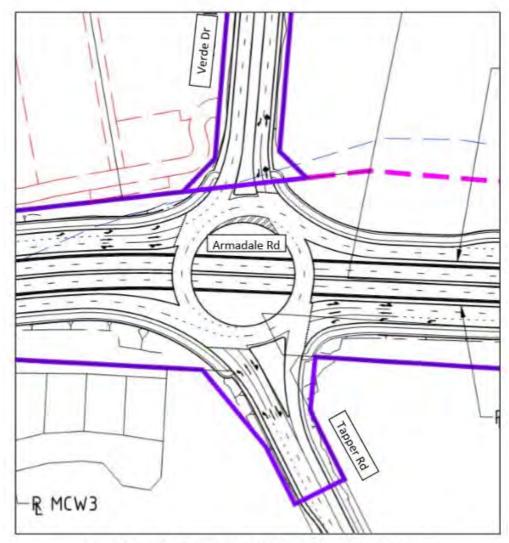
Armadale Road/Tapper Road/Verde Drive Intersection Layout
